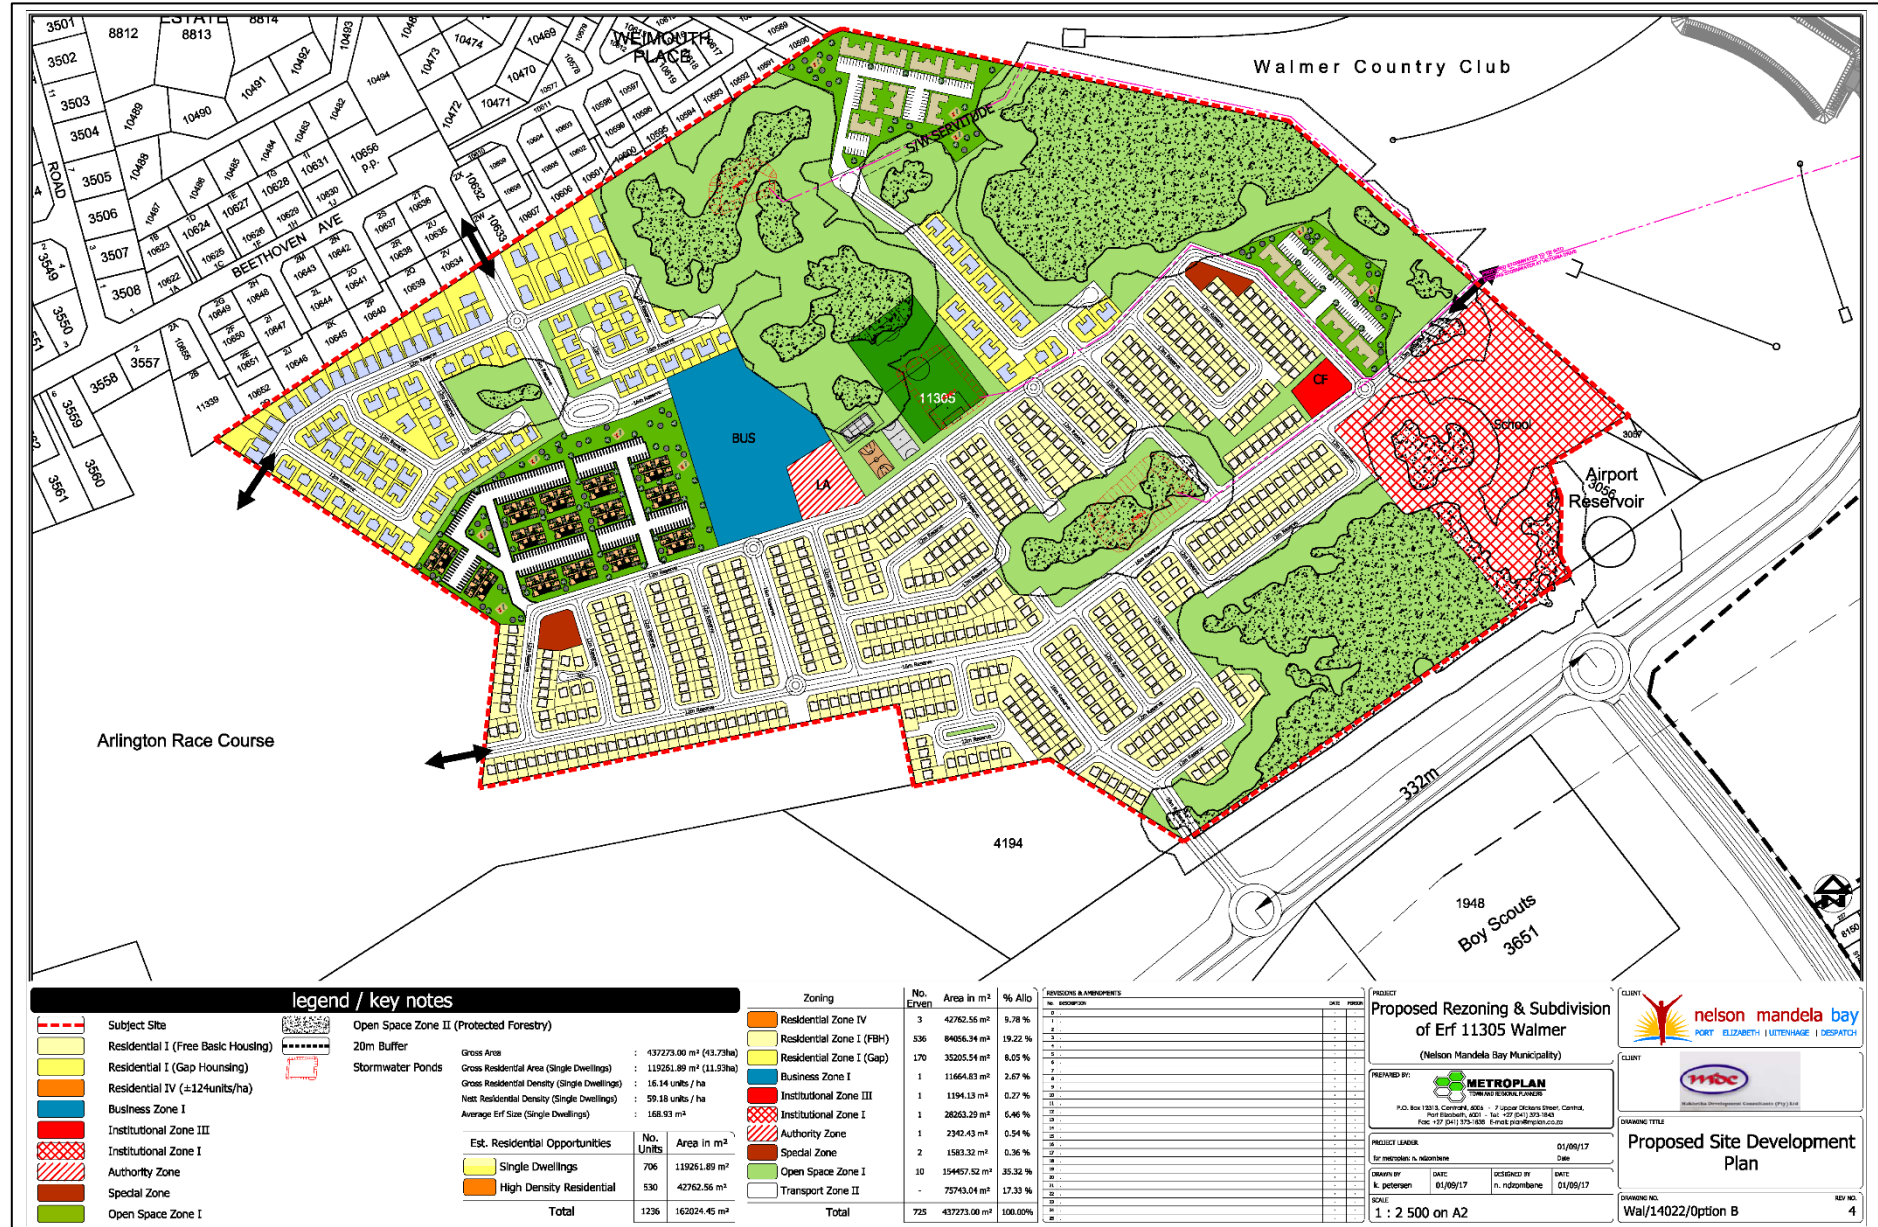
Preliminary proposed site development plan Layout Option B (with 20m forest buffers)
